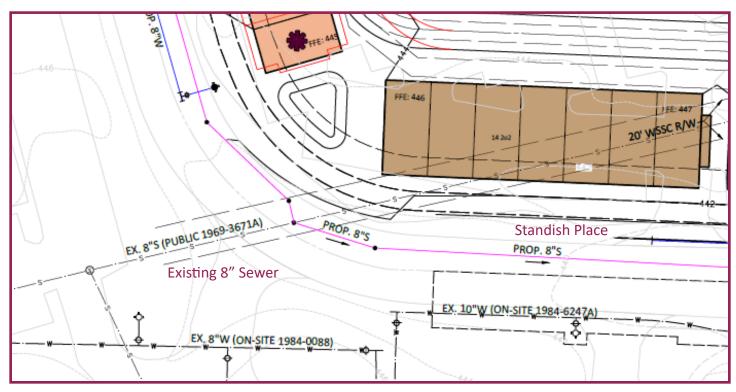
Existing Sewer Main Location (with Proposed Site Layout)
